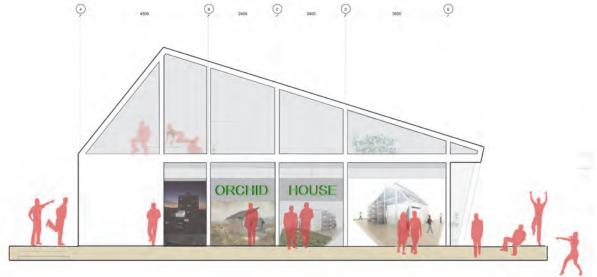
West Elevation with projection on the thermal wall
